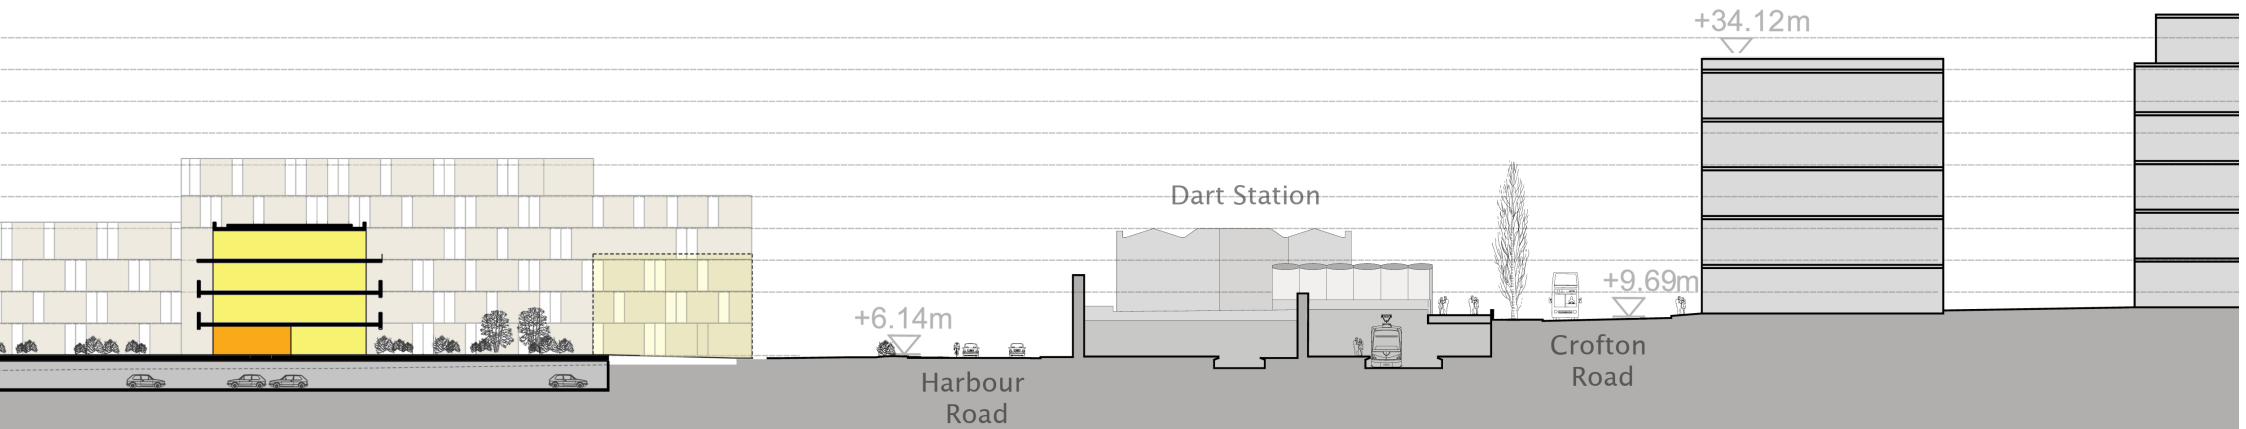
View towards east side of St. Michael's Pier from Carlisle Pier
